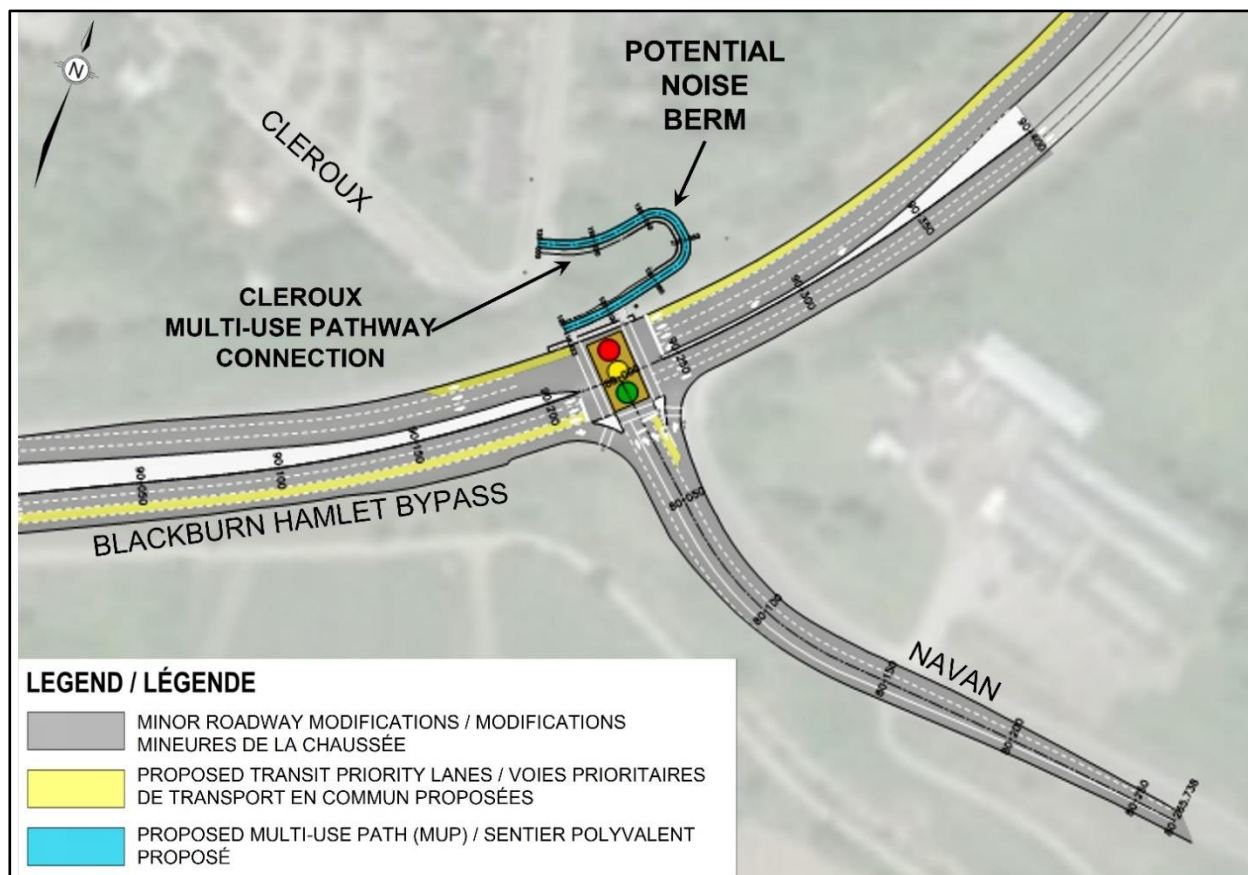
Recommended Plan - Blackburn Hamlet Bypass & Navan Road Intersection
